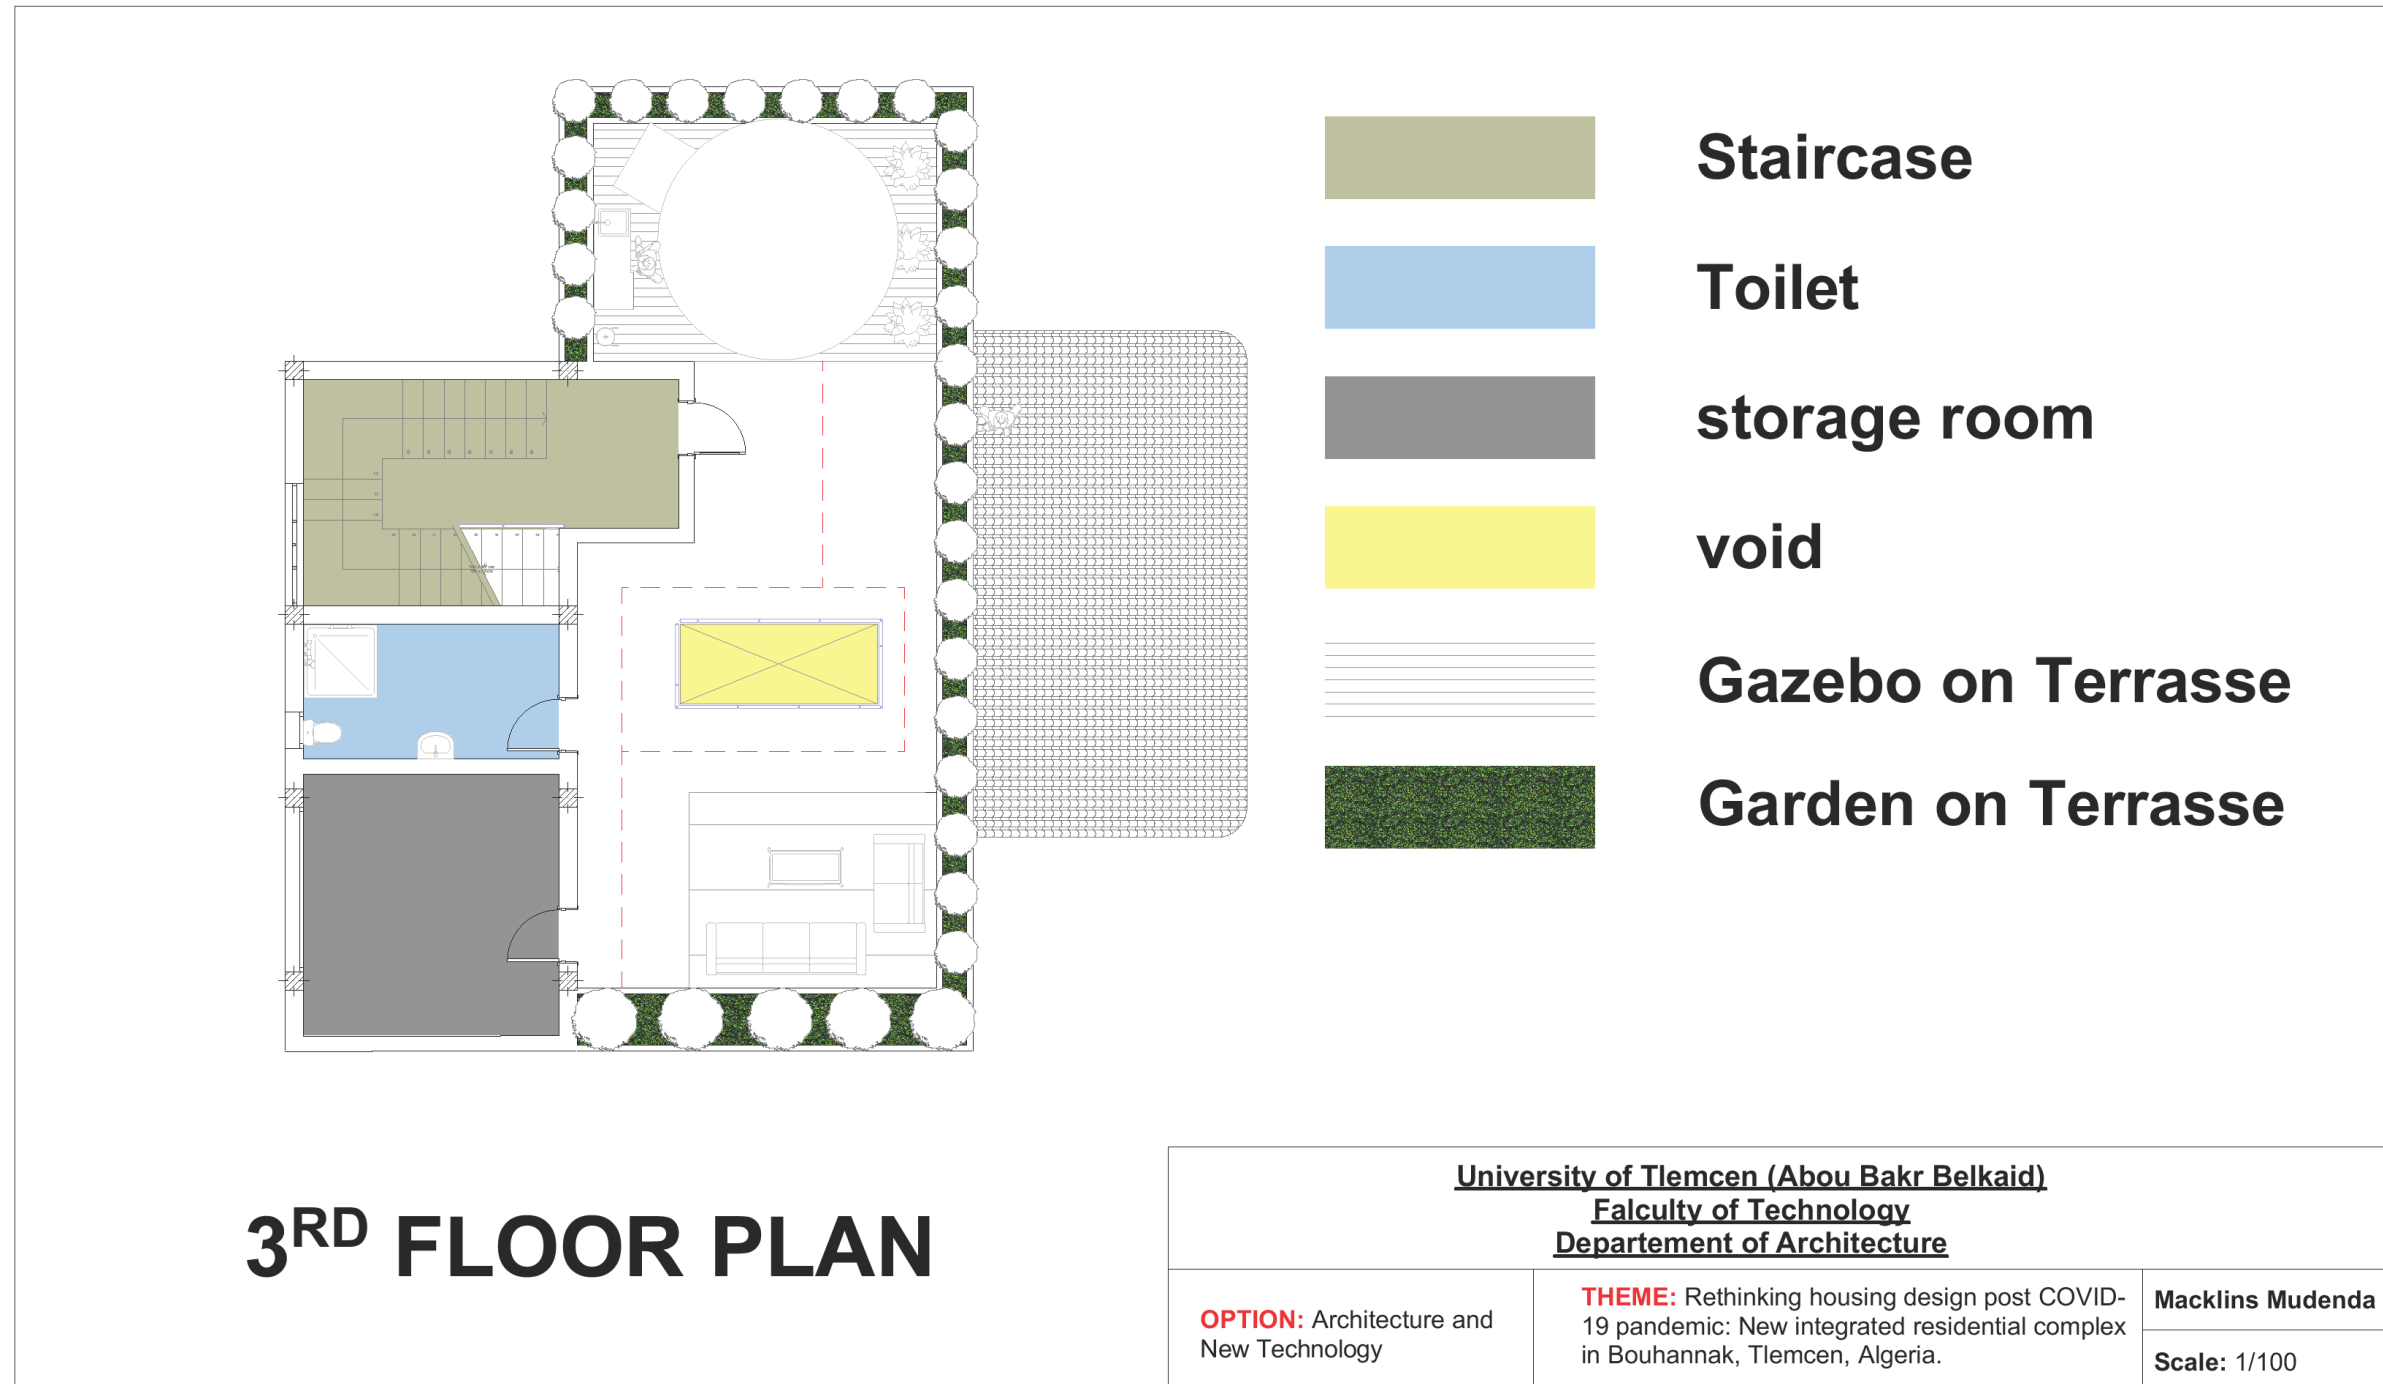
LAST FLOOR FOR THE INDIVIDUAL HOUSE:
